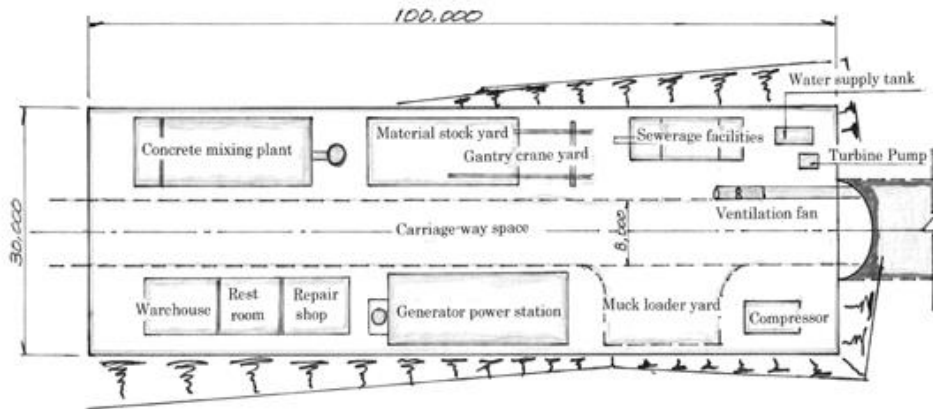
PLAN THE TYPICAL TEMPORARY FACILITIES
